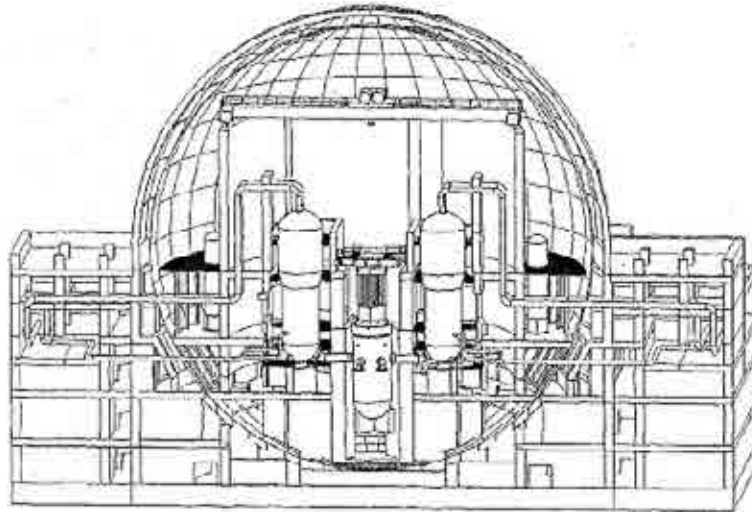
System 80+ cross-section showing the spherical steel containment inside the reinforced concrete secondary containment [592].
